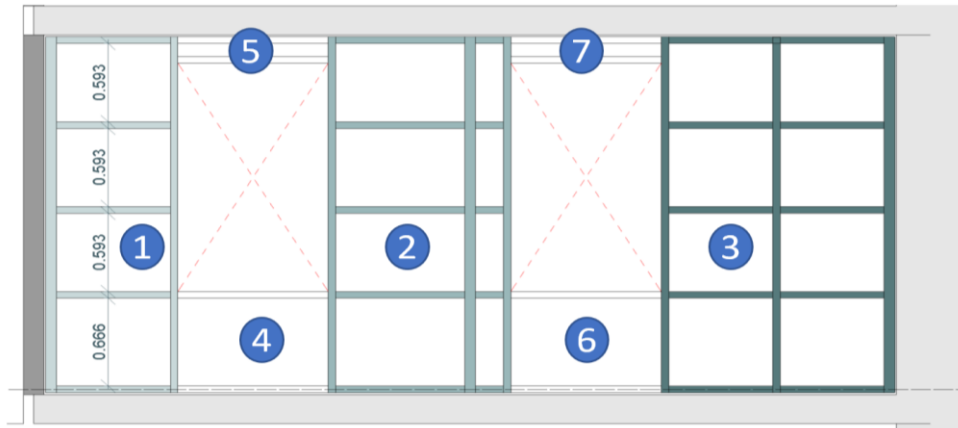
Pamplona oPEN Living Lab, San Pedro. South façade view from the inside, by authors, 2023. Copyright 2023 by oPEN Lab.
